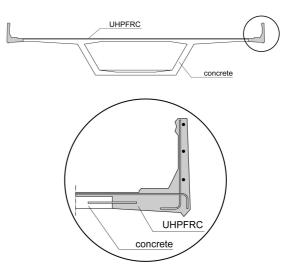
Conceptual idea for the improvement of deck slabs of existing concrete bridges
